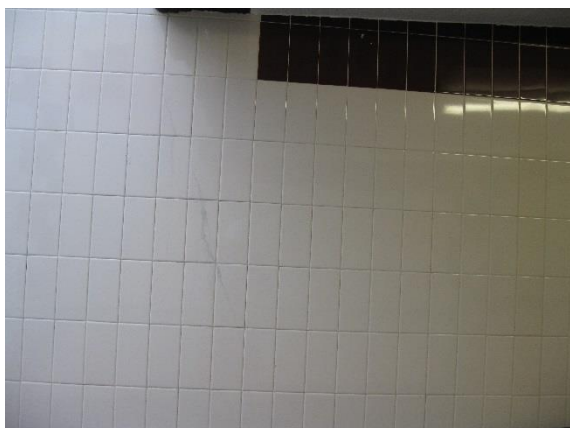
Hair Line Cracks in the Wall Tiles
